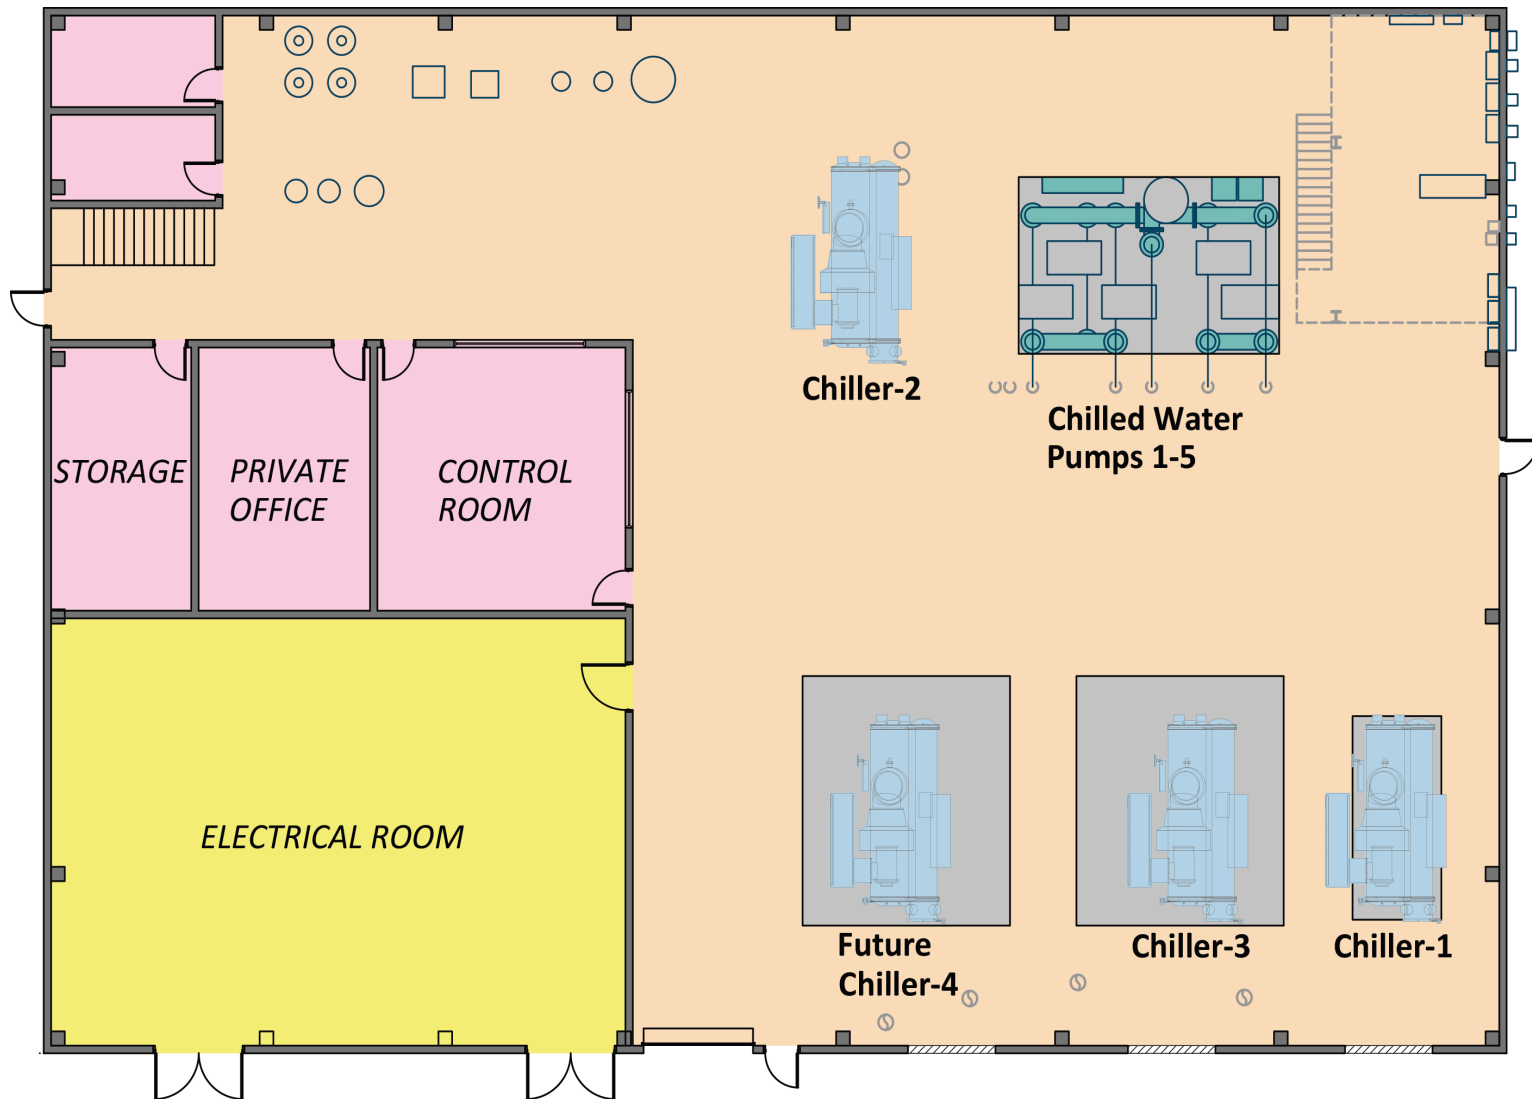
EXISTING CENTRAL PLANT LAYOUT
